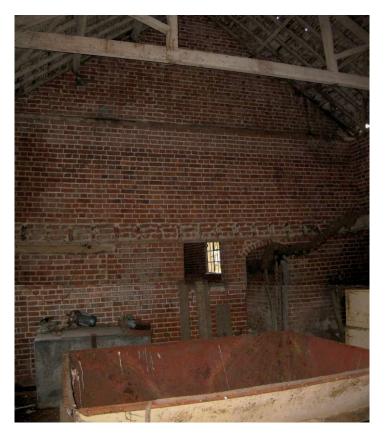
Interior of main barn, west gable end, showing change in brick coursing, holes for joists to upper floor and blocked doorway, looking west
